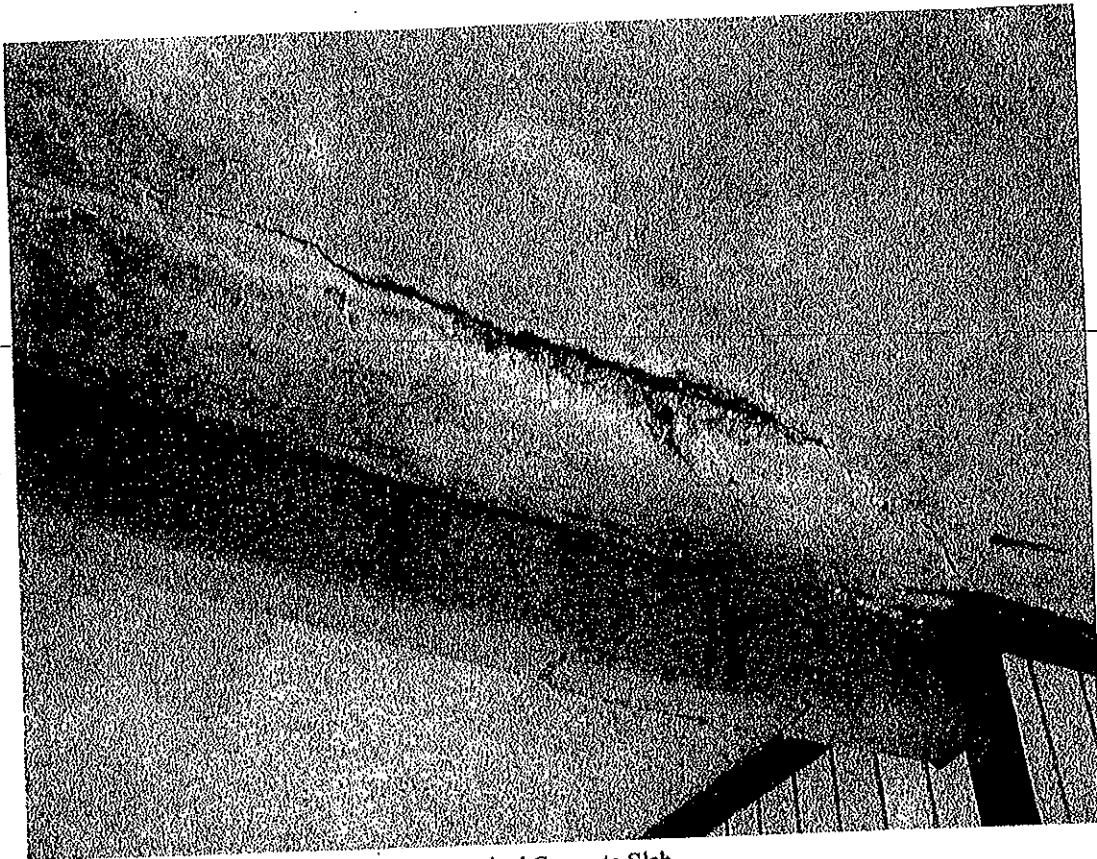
Rusted Reinforcing Steel and Cracked Concrete Slab
